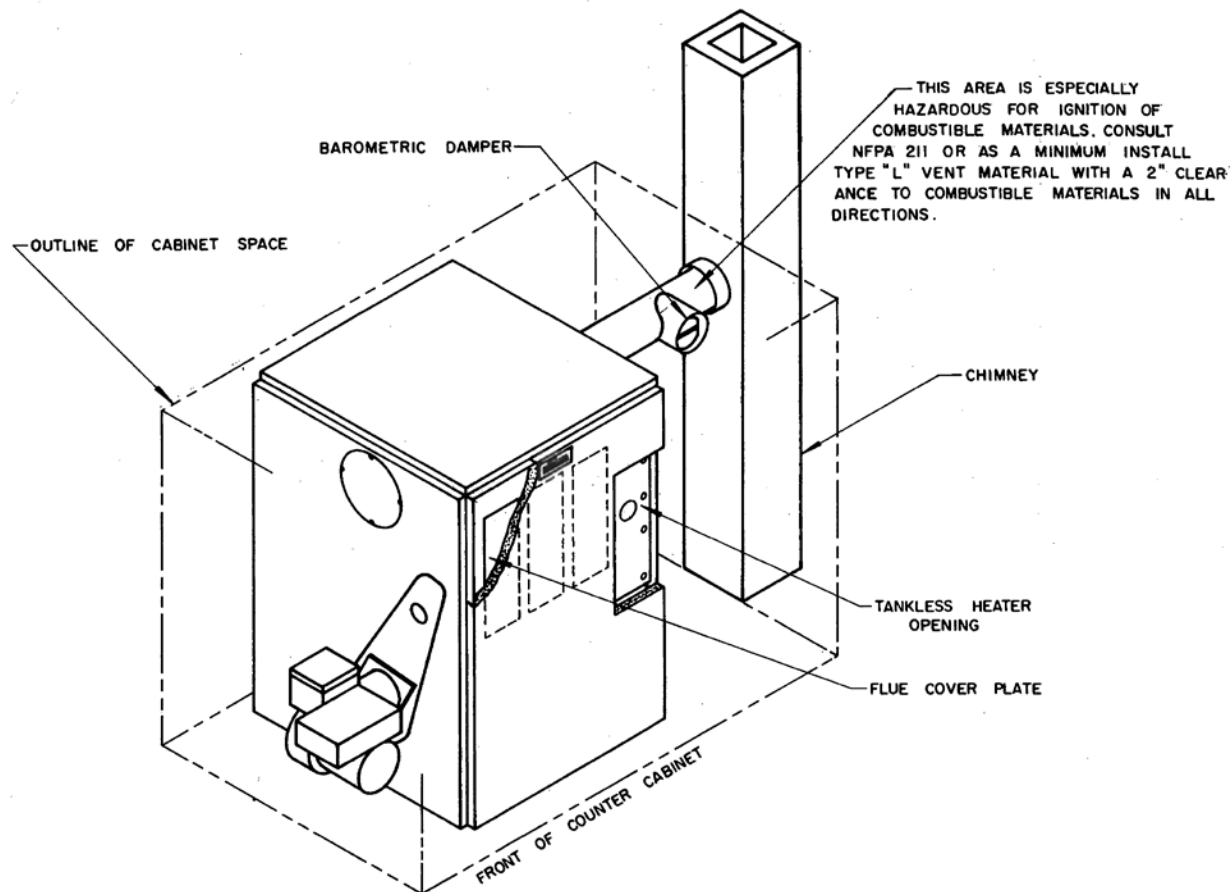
Installation of FO in a Confined Space with Adjacent Chimney
